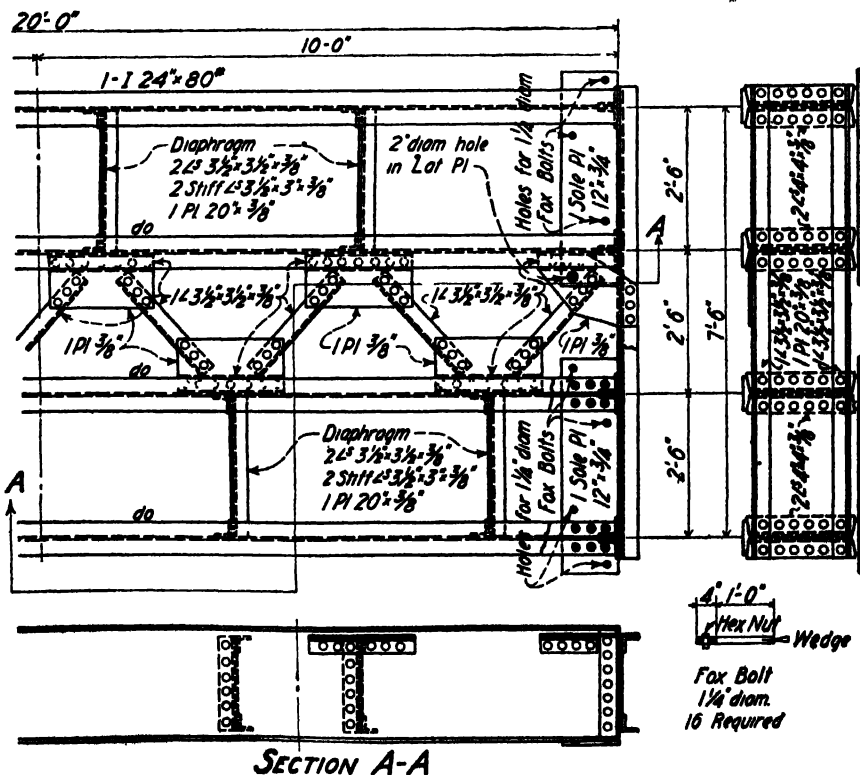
Details of a Railway, I-beam Span with Four Stringers per Track.
